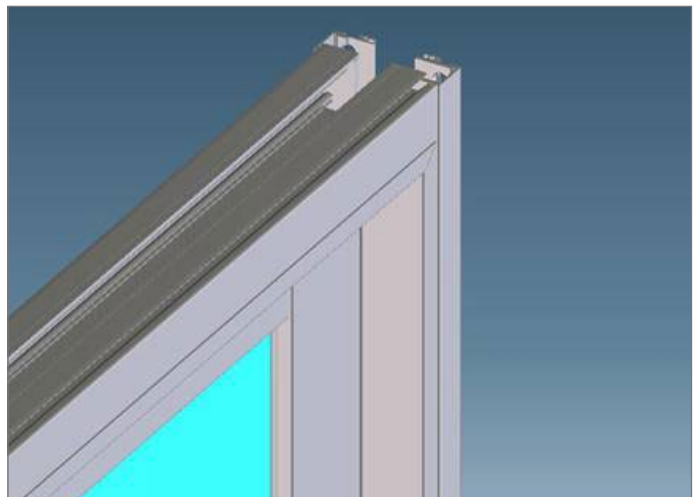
Assembled view of modified Butt Hinge Stop for application of aftermarket Gasketing.
